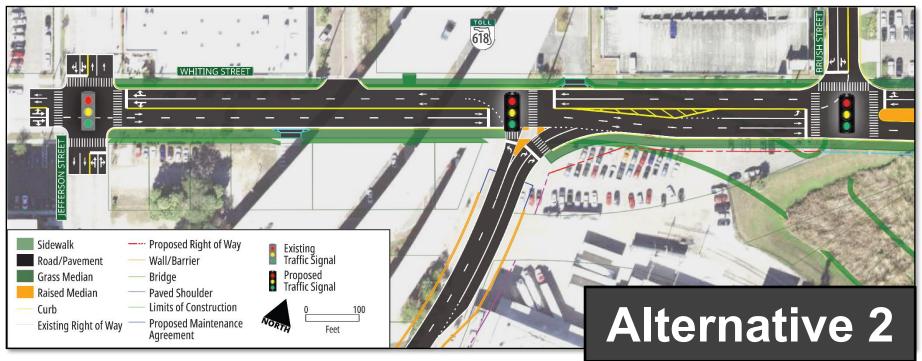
Alternative 2 – Whiting Street from Jefferson Street to Brush Street
